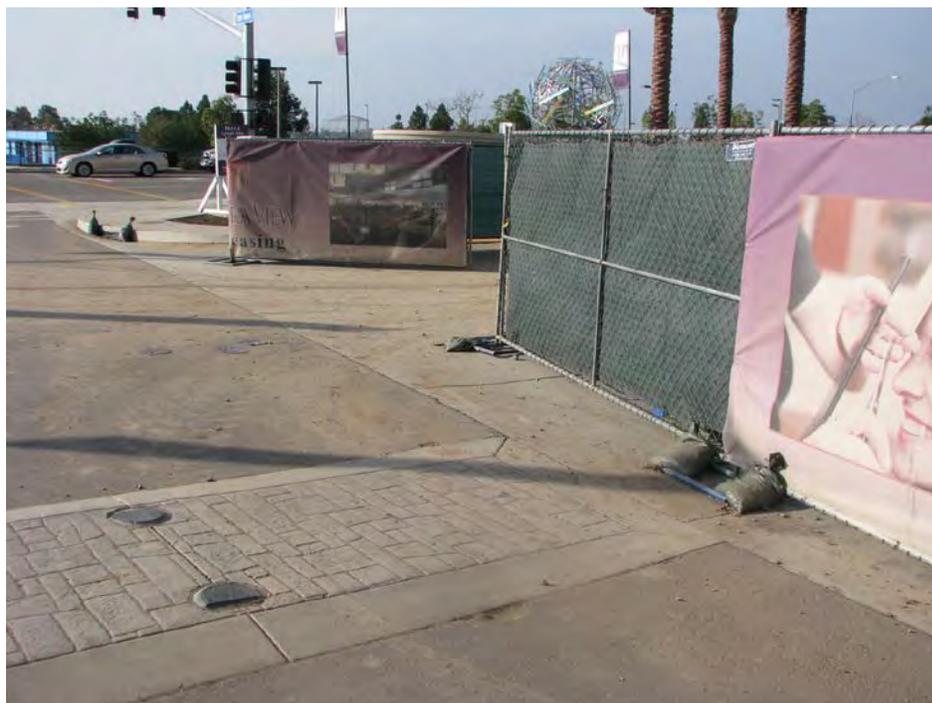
South-facing construction entrance; no BMPs; sediment tracking onto street
